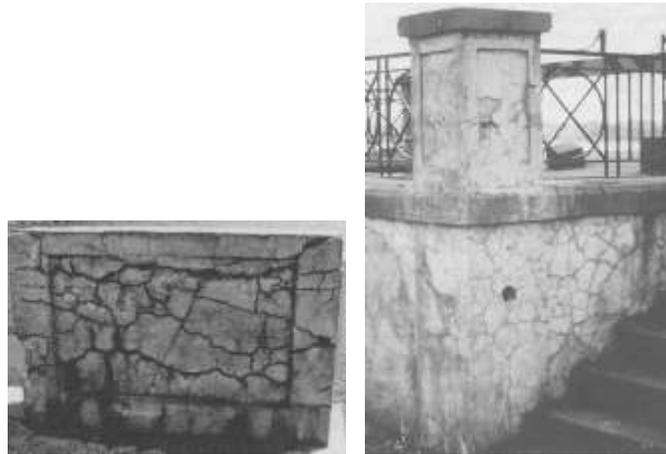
Examples of ASR in a beam (Bragg 2000) and a retaining wall (Shrimer 2000)
